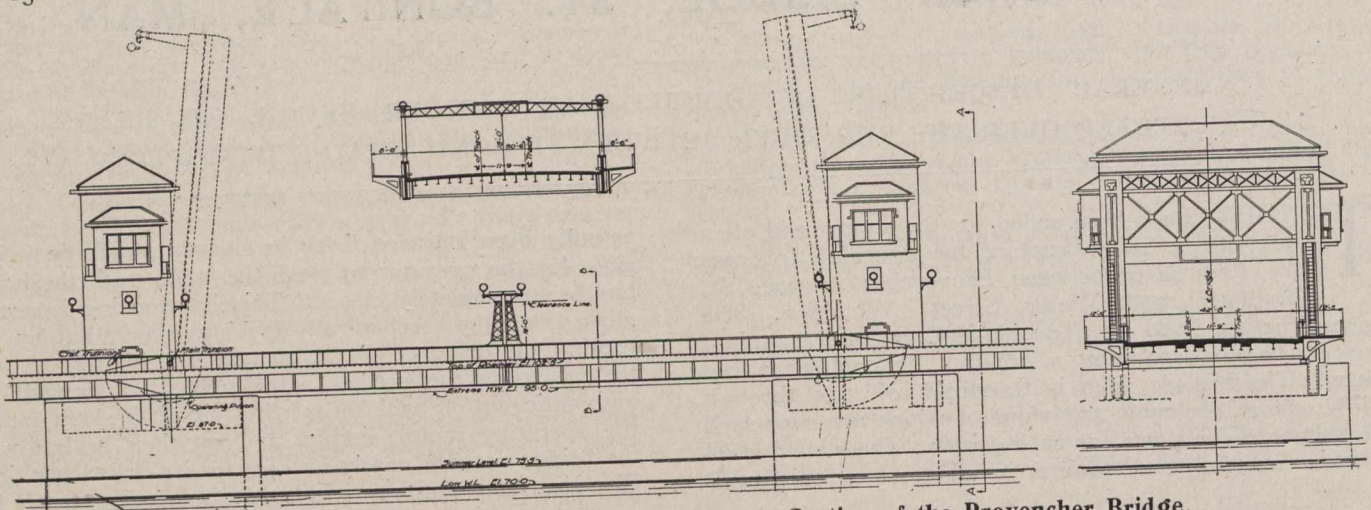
Elevation and Sections of the Bascule Section of the Provencher Bridge.
